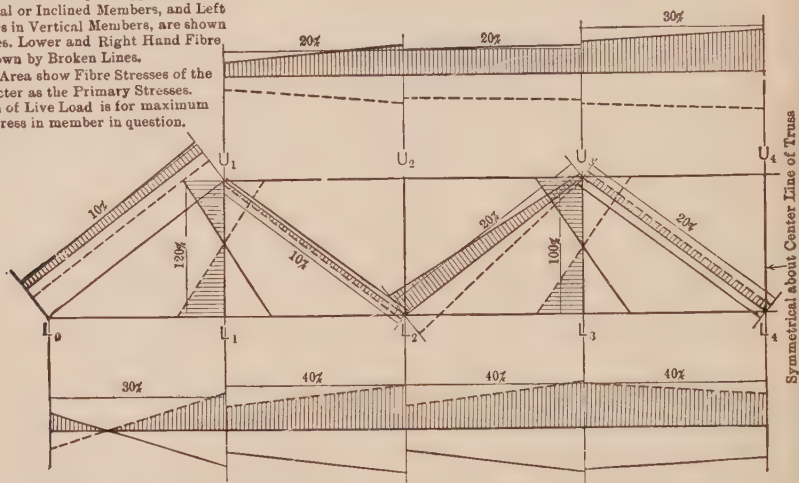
Secondary Stresses in a Riveted Warren Truss.
